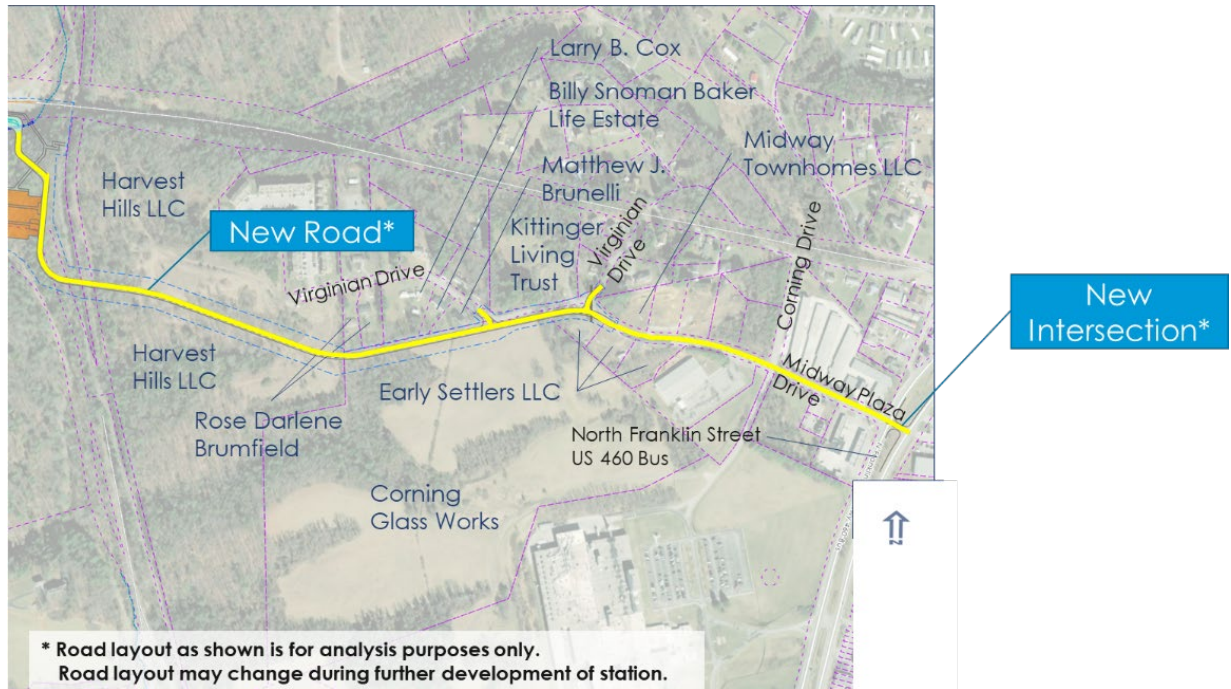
ROADWAY IMPROVEMENTS TO MERRIMAC ALTERNATIVE
